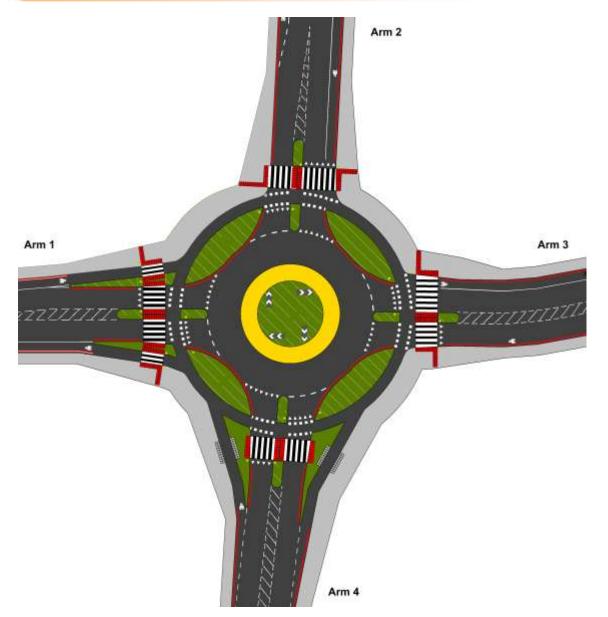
Layout of the Dutch-style Roundabout with Dutch road markings
